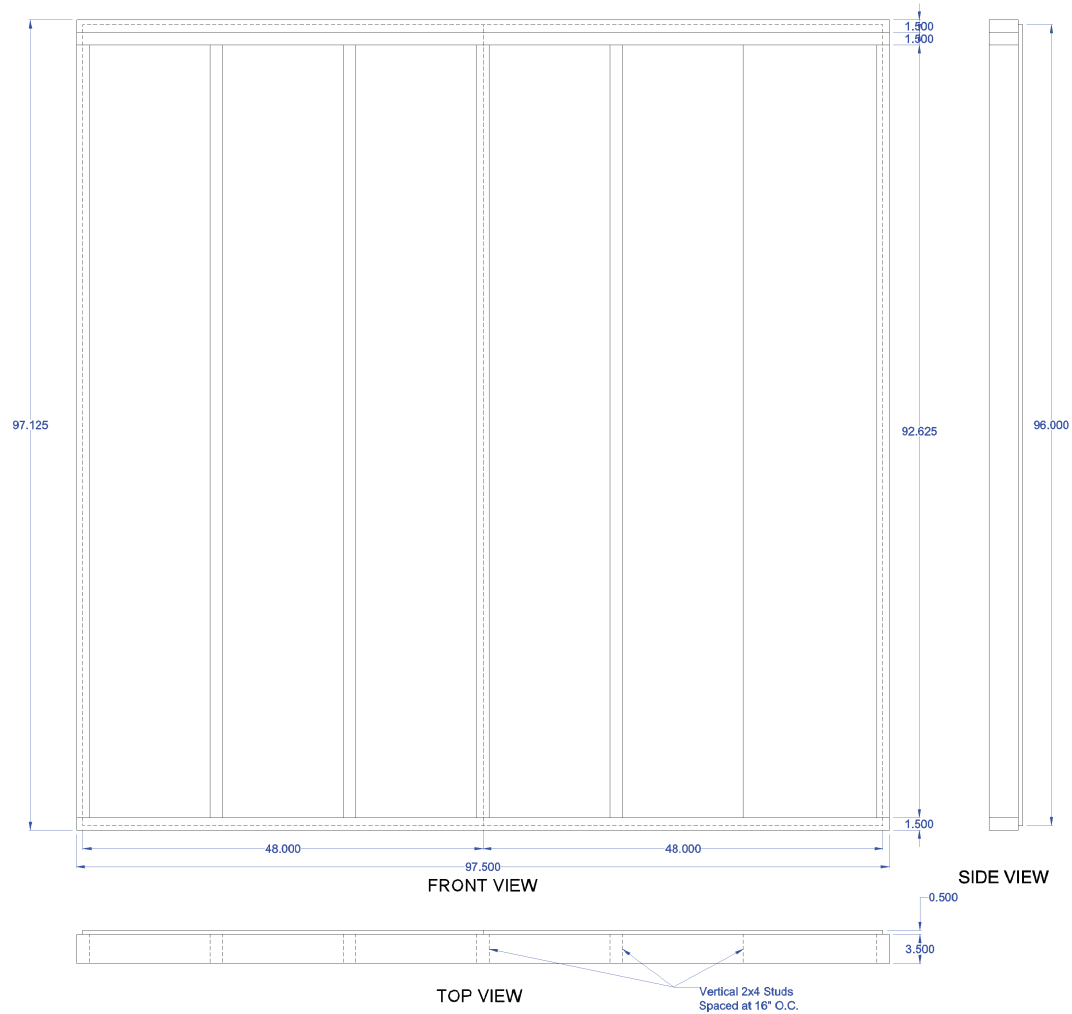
Timber wall dimension detailing. All dimensions are in inches.
